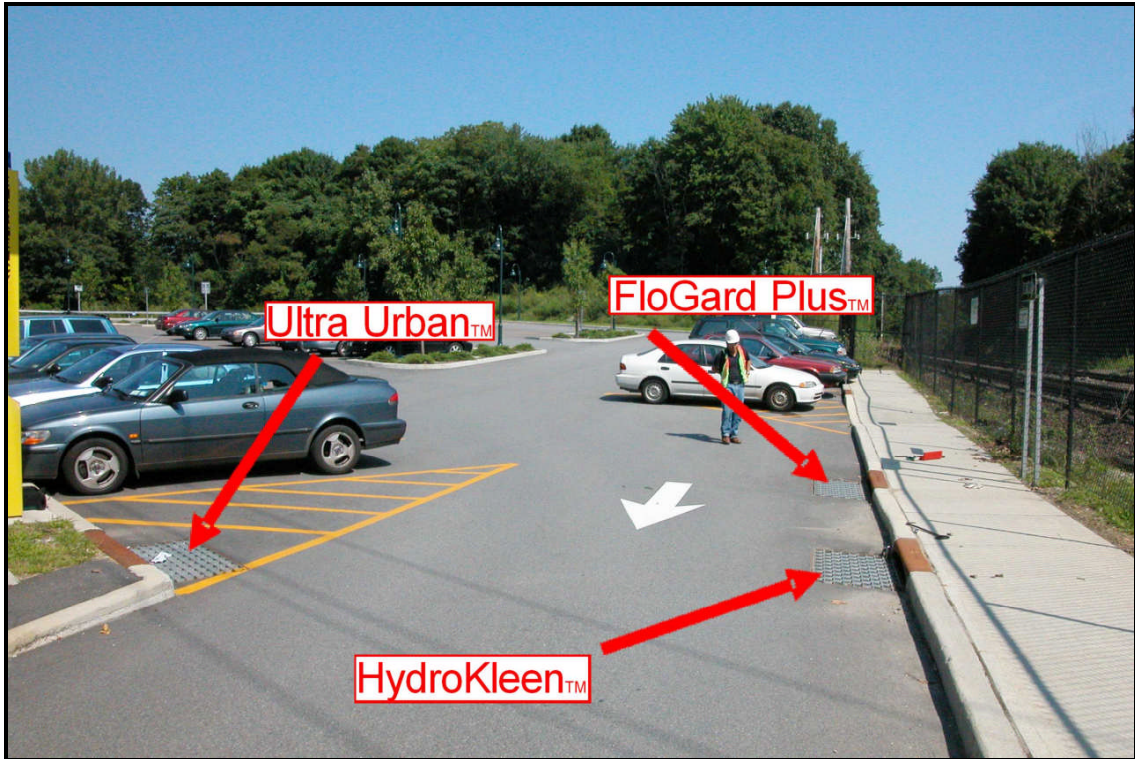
Catch basins locations, Goldens Bridge Metro North Station Parking Lot.
